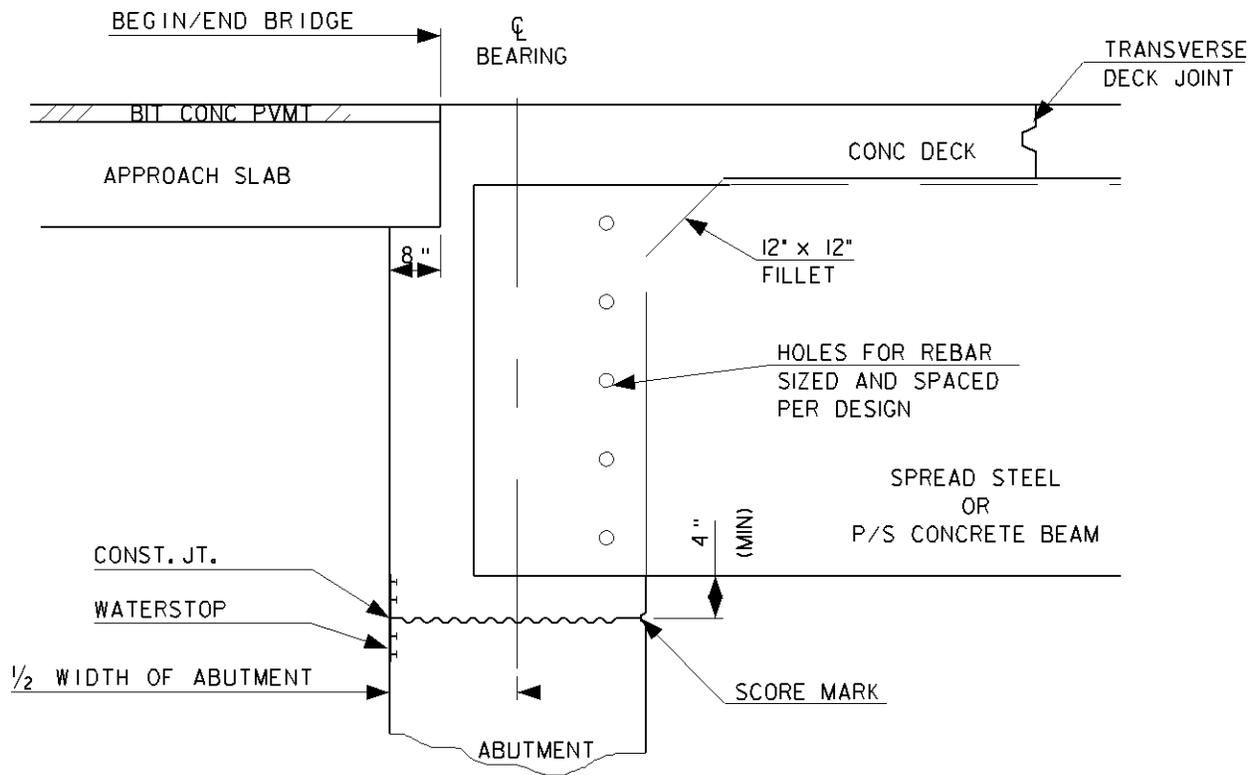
1 Type A – Bridge Ends for Integral Abutment Bridges with Approach Slabs.
